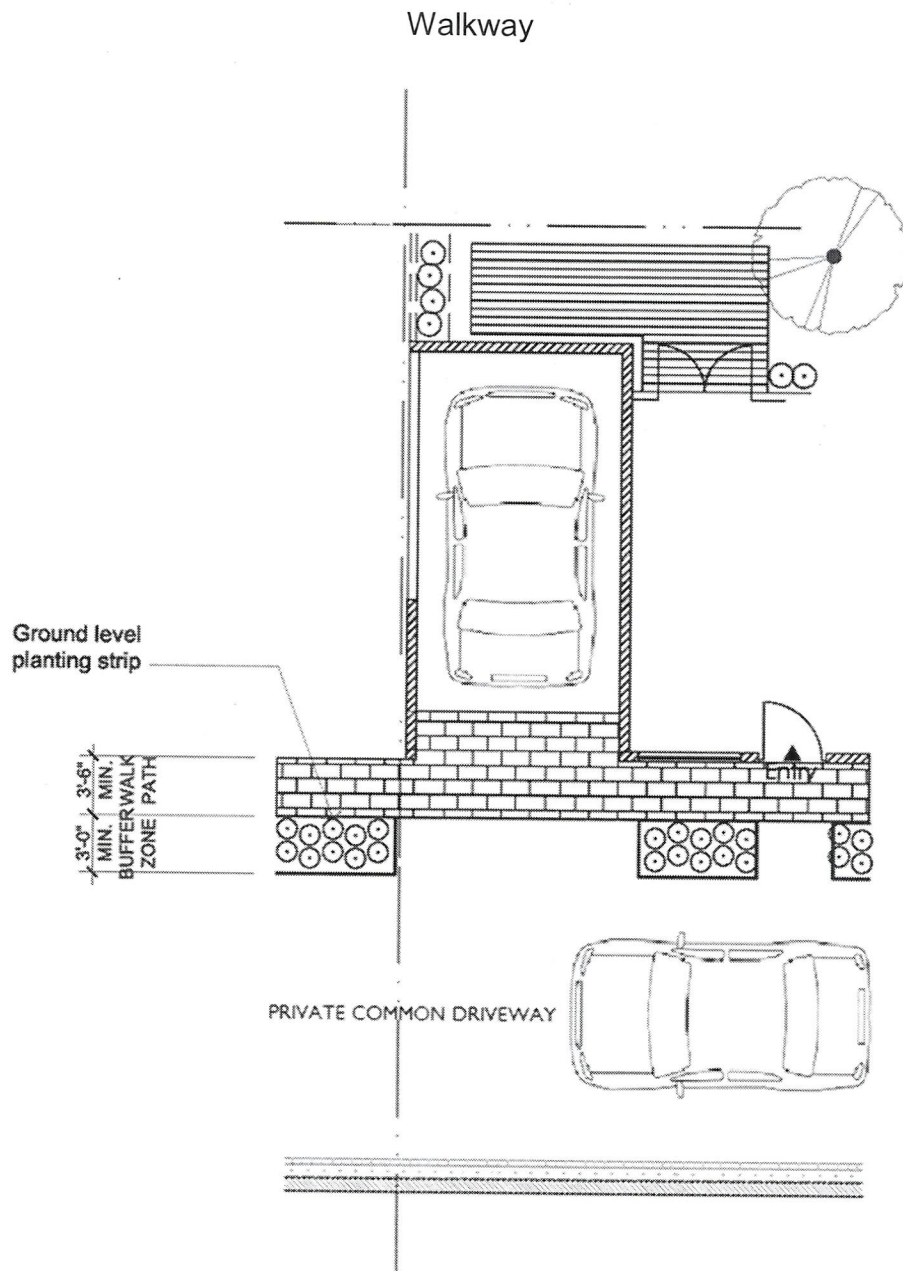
B: Landscaped Buffer between Private Common Driveway and
